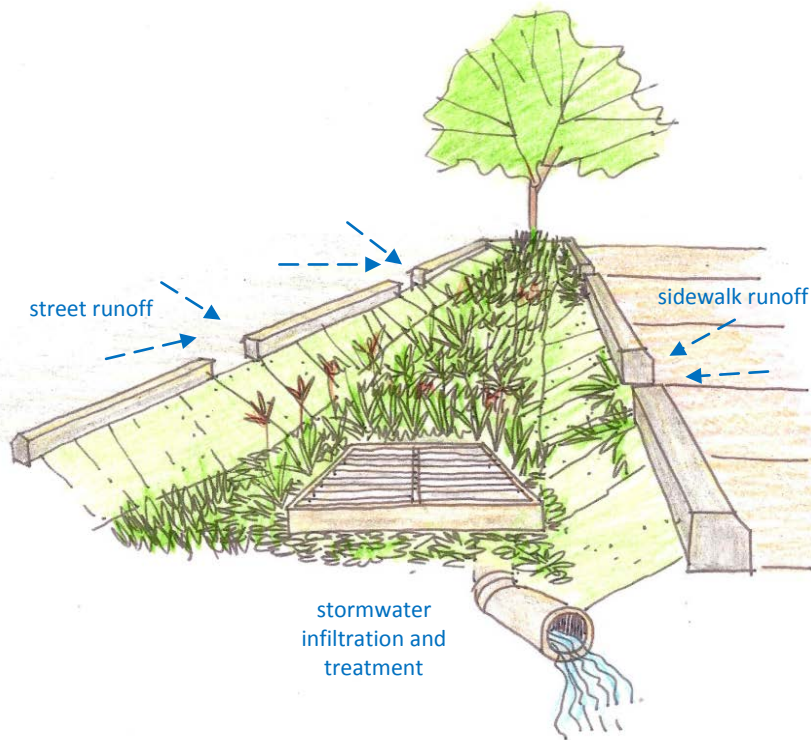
Perspective illustrating the street bioretention planter at the sidewalk
